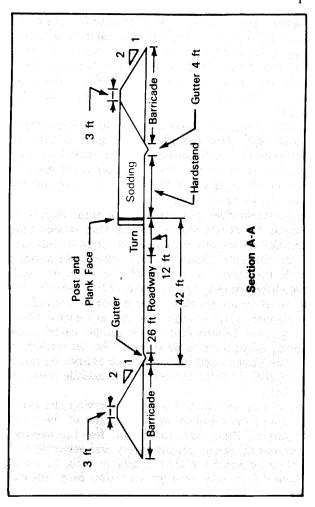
Cross Section of a Typical 8-Cell Module Storage Plan.
